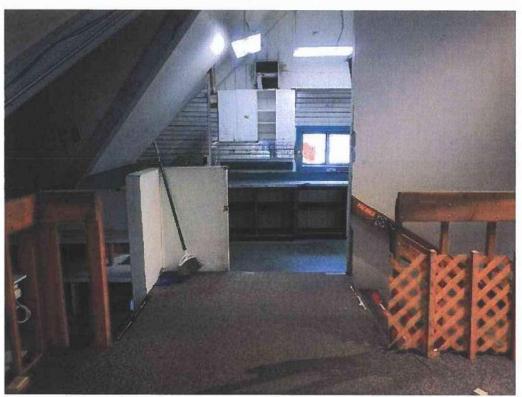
Work room on mezzanine level Note: sheet vinyl floor, fan and exhaust piping
